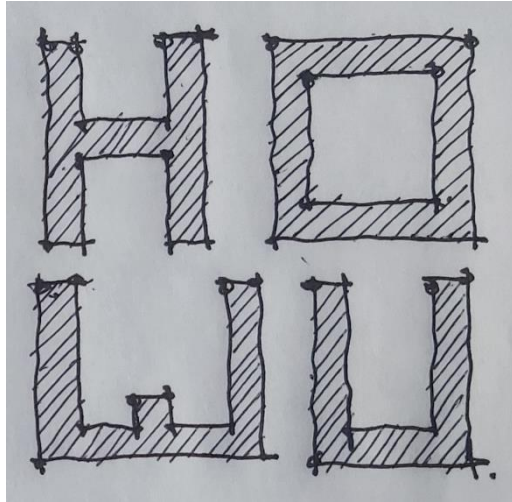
Image of building plans with good access to natural light and with good potential for natural ventilation.
